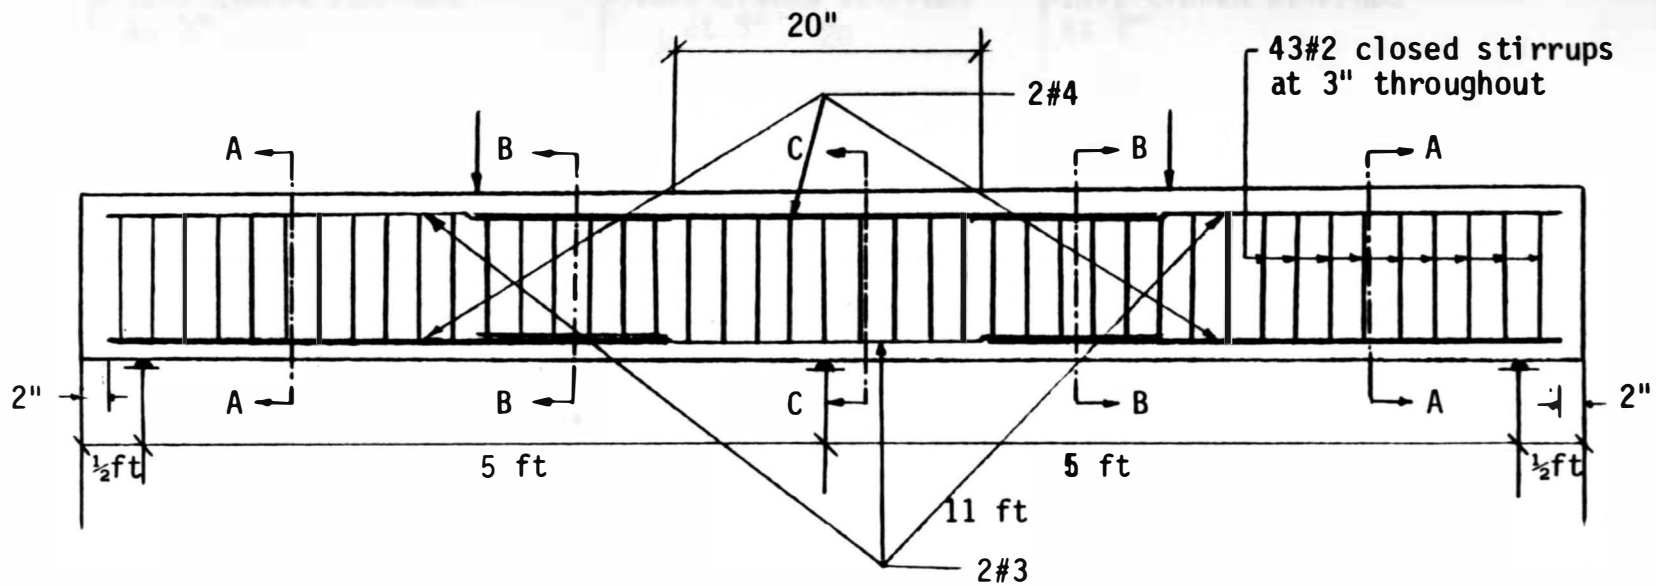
Reinforcement details of continuous beams 1, 4 and 7.
